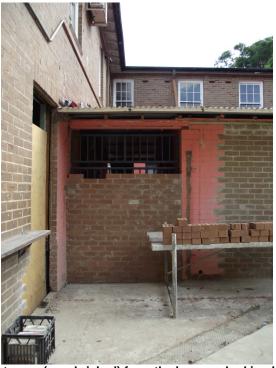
View of above entrance (now bricked) from the laneway looking back into the rear bar area (dated 17 May 2017)
